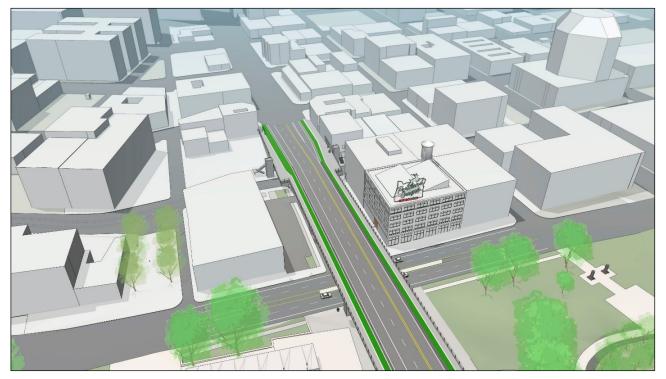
Artist's rendering of replacement west approach span, aerial view looking northwest (Fat Pencil Studio, 2021).
